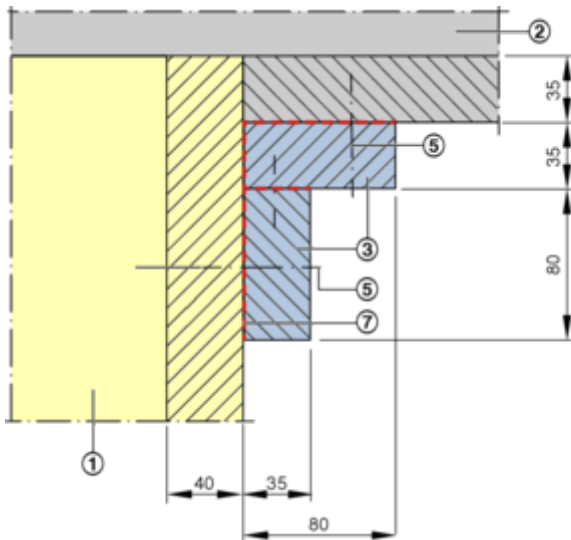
Installation detail C2: Angle section connection, damper in duct
